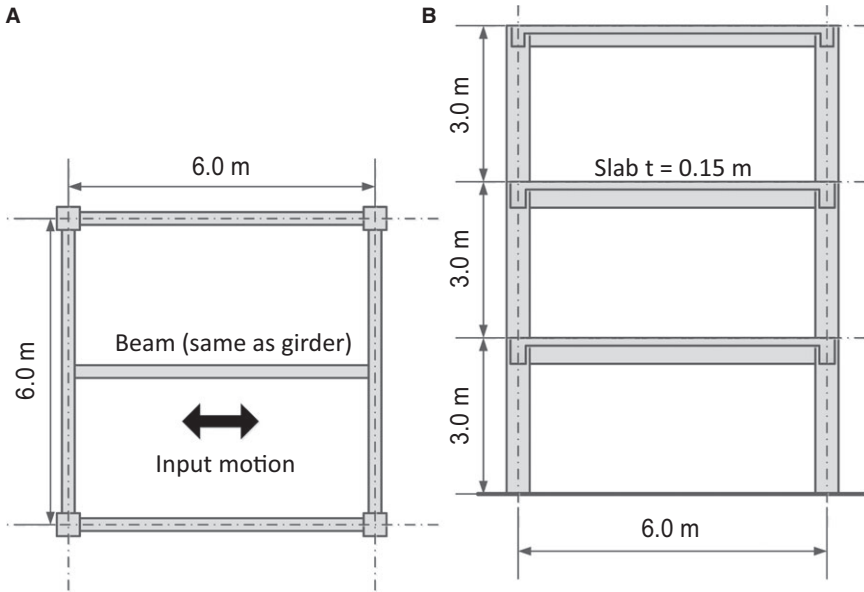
Dimensions of test specimen (see Refs. 21-25): (a) plan view; (b) elevation
